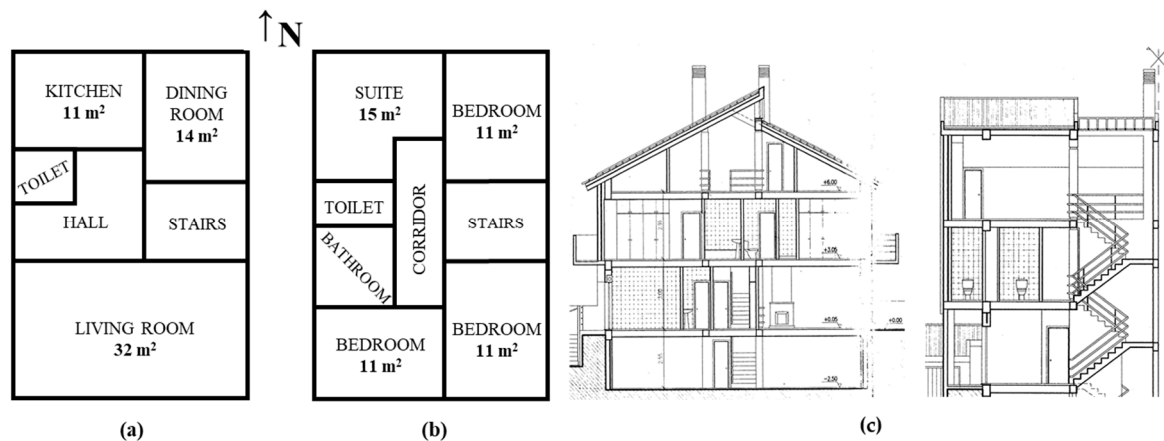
Plans of the residential building: (a) ground floor and (b) first floor, and (c) building sections.
